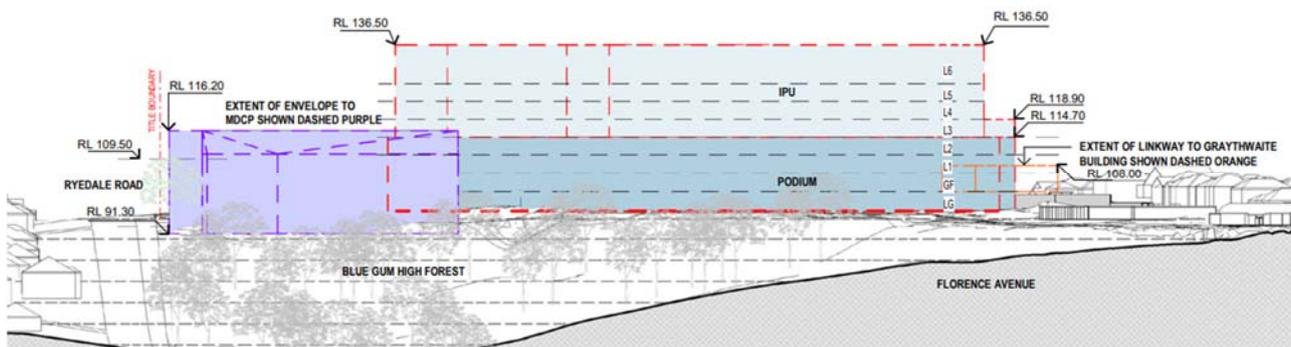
Building Envelope North Elevation – from Fourth Avenue
